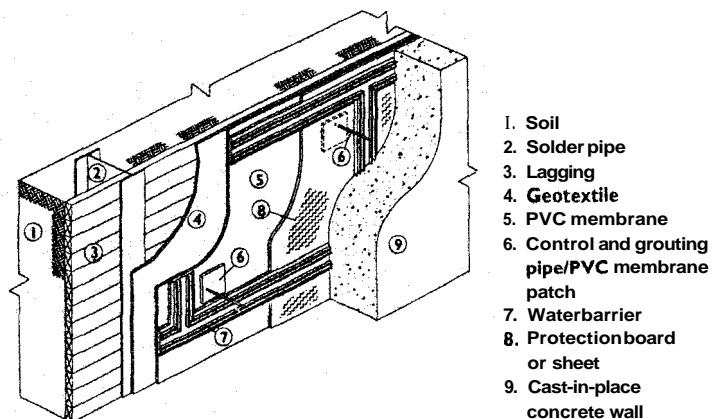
Cross-section of PVC sectioning showing water-stop and control grout-pipe placement (Mergelsberg et al. 1996).
